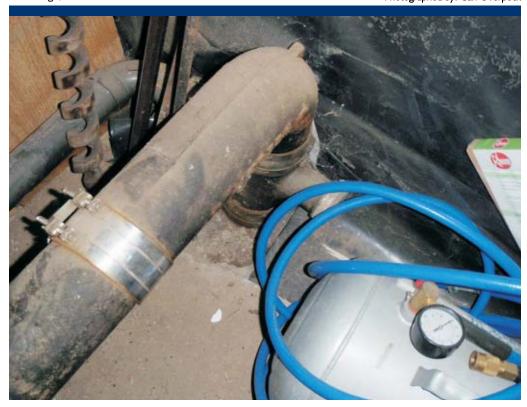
Sewer pipe penetrating slab with exposed gravel.
